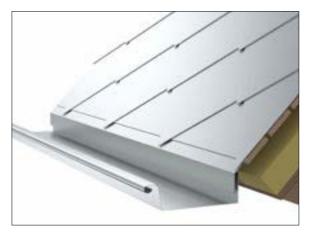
Details lozenge system on a ventilated substructure.
